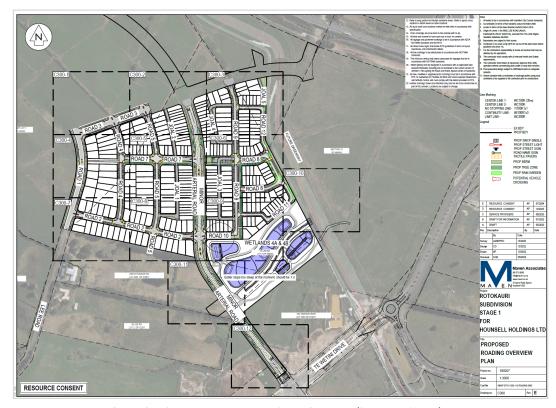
Current Maven Associates CDP Roading overview Plan
